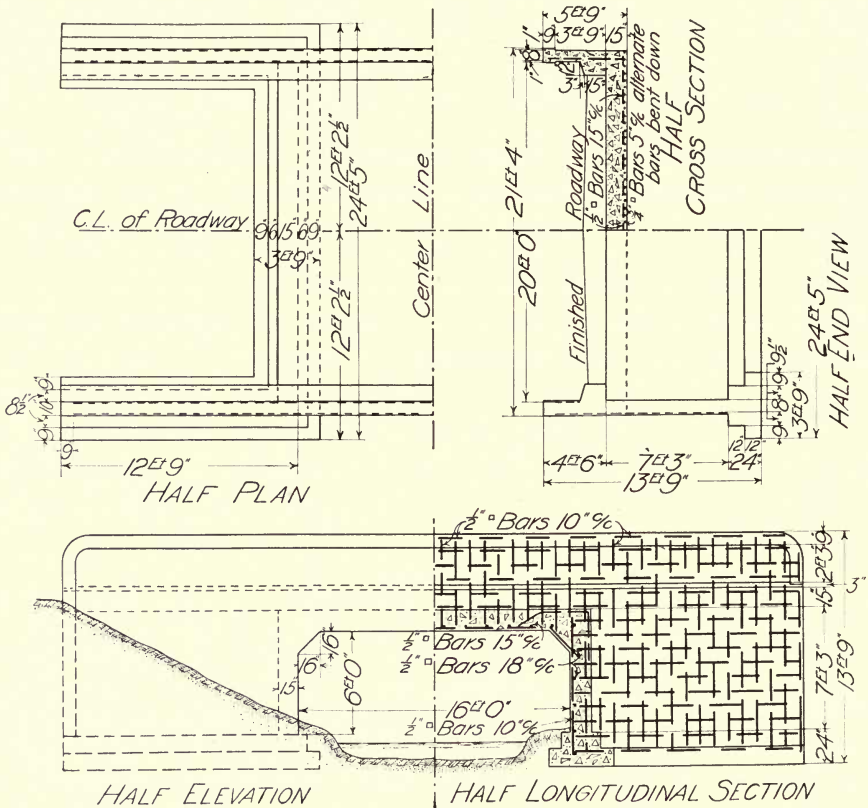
SLAB BRIDGE WITH SPAN OF 16 FEET.
